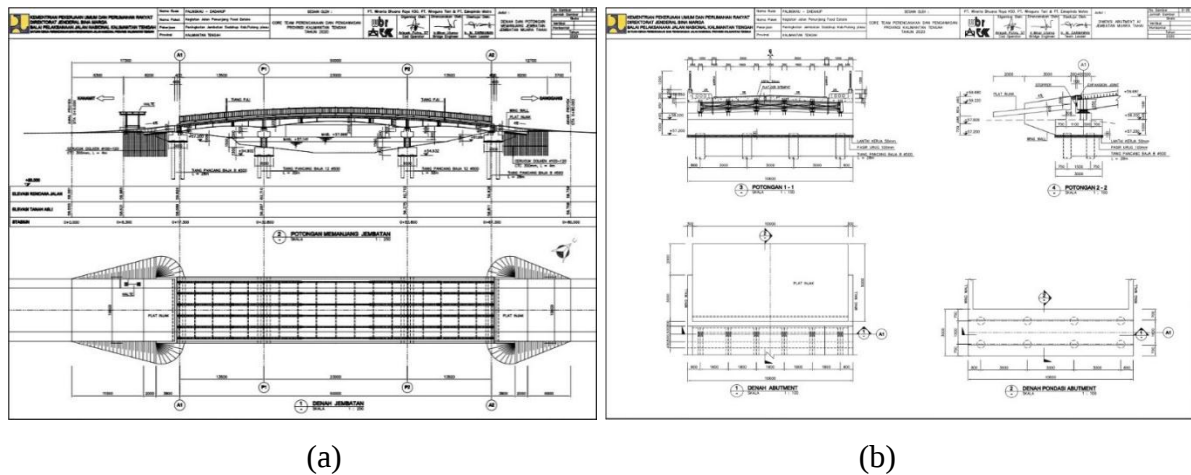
(a) Plans and longitudinal sections of the Muara Tahai bridge; (b) Muara Tahai bridge abutment dimensions
